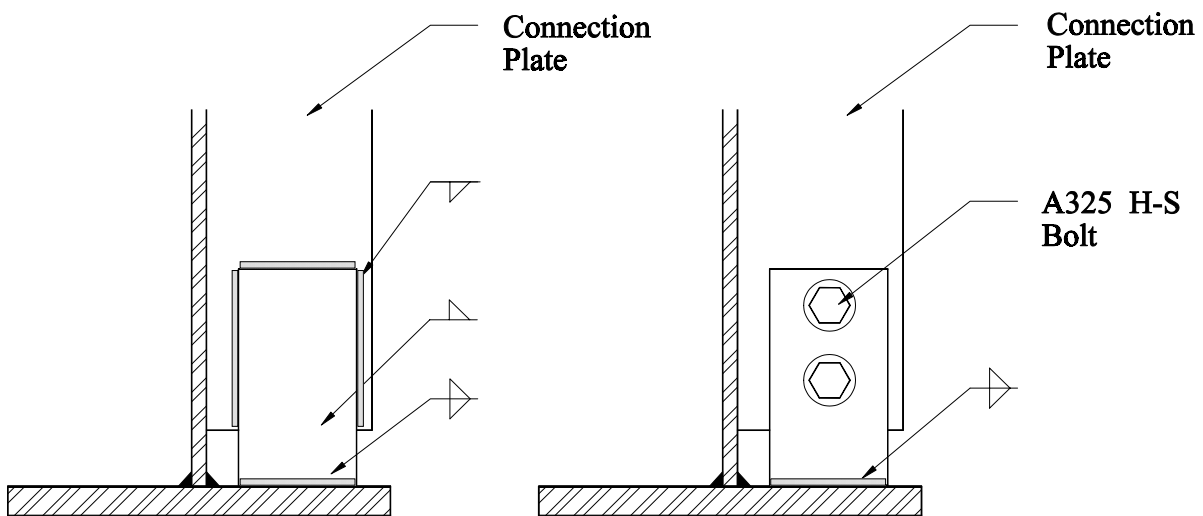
Welded and bolted extension tabs for welded attachment of cut-short connection plate detail.
